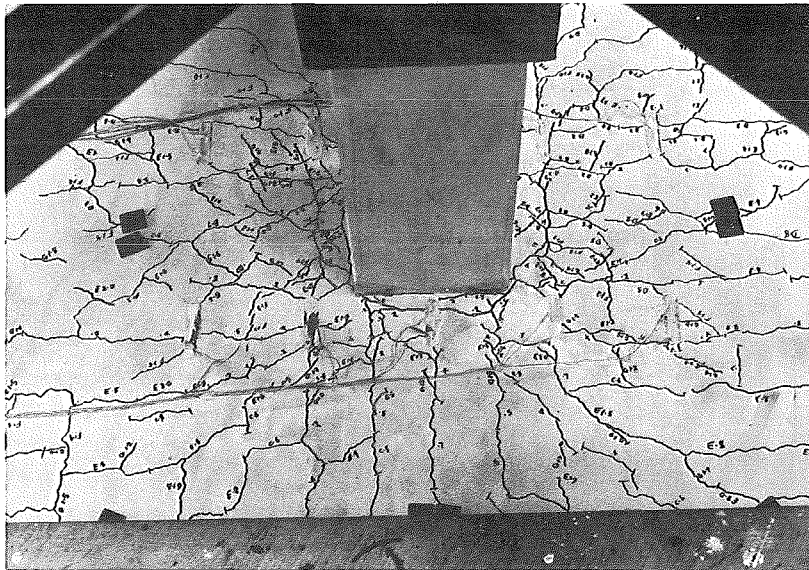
CRACK PATTERN OF SPECIMEN 3C
